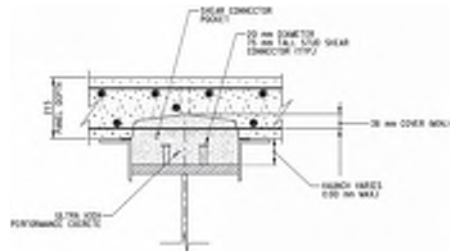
Connection detail of precast panel and steel girder using UHPC (Reprinted with permission from NYSDOT)
